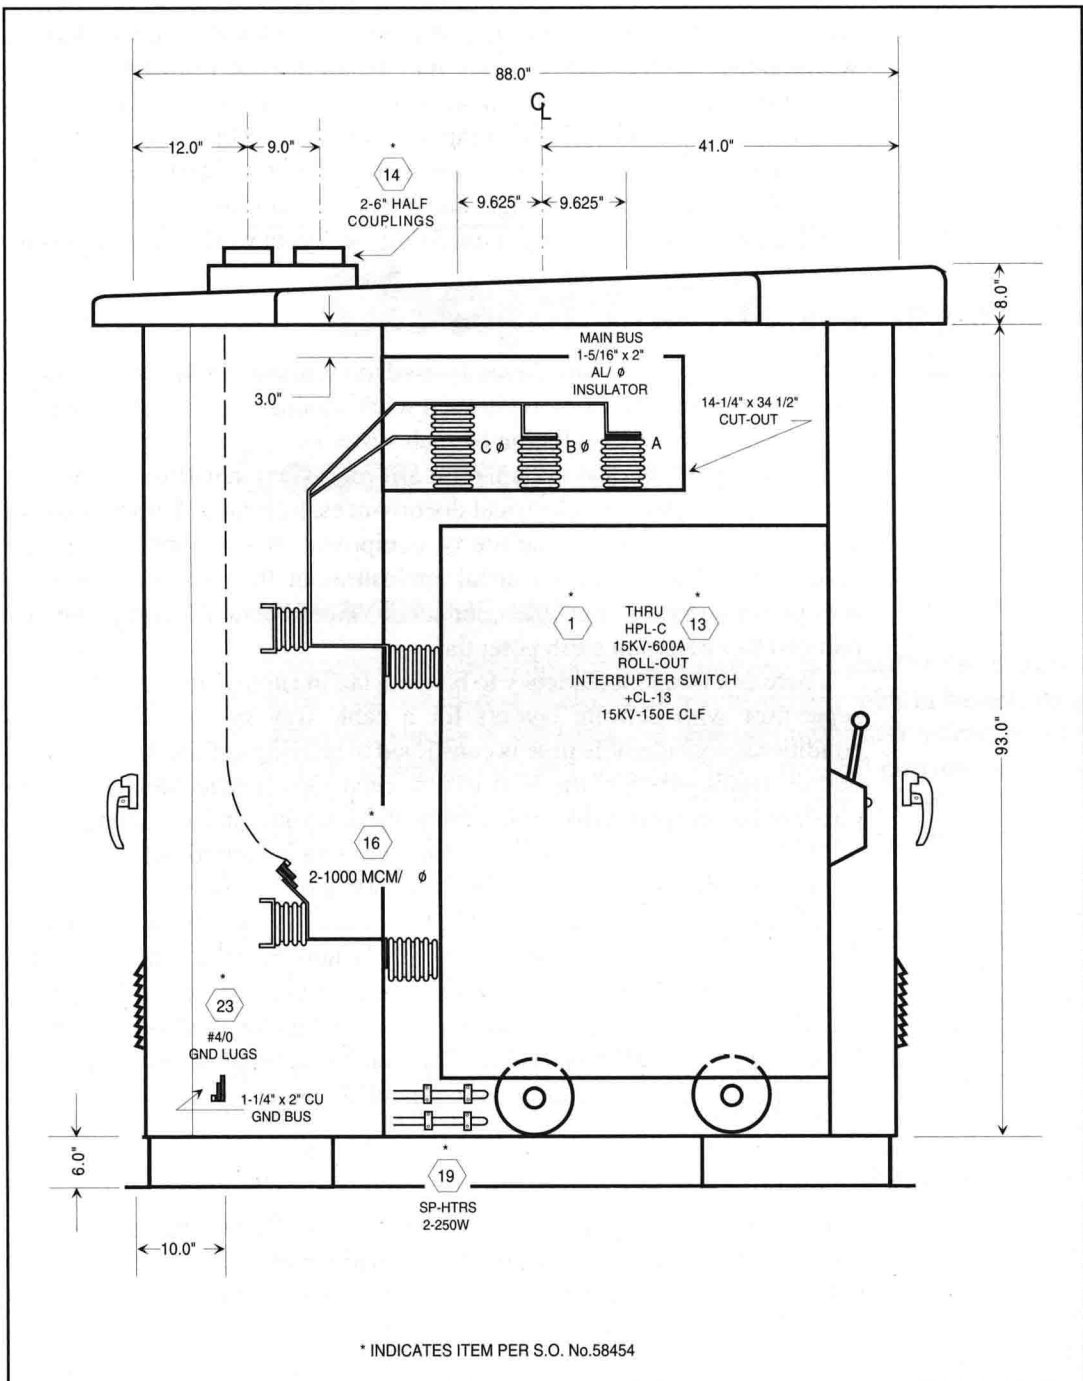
Shop drawings greatly facilitate the installation of special electrical equipment.
